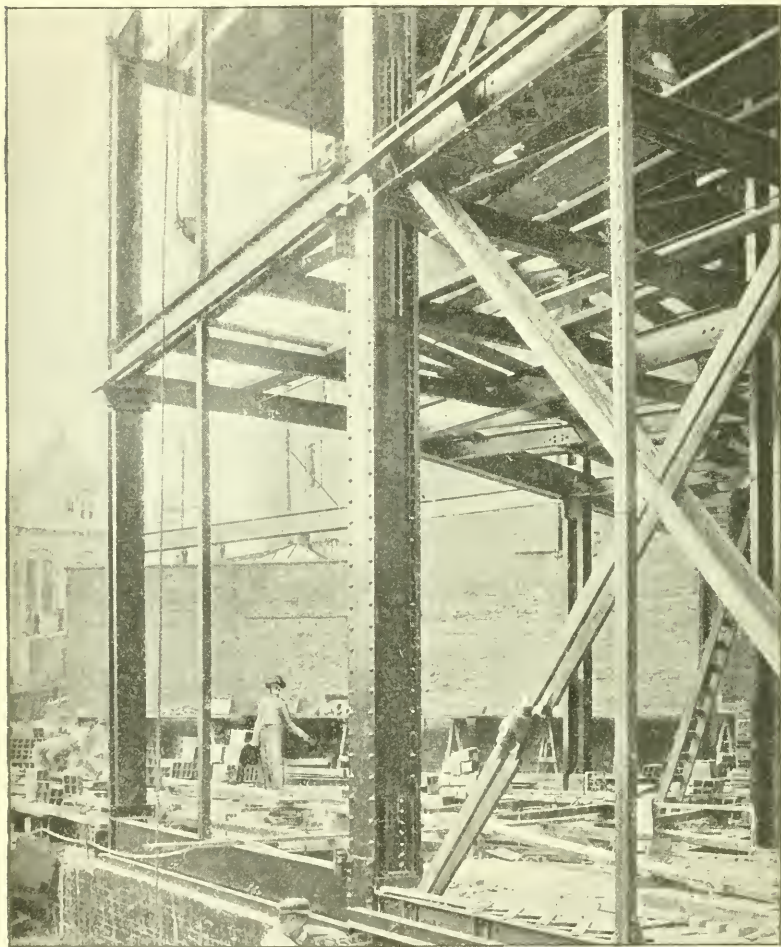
STEEL BRACING WITH DIAGONAL BARS, D. S. MORGAN BUILDING, BUFFALO, N. Y.
